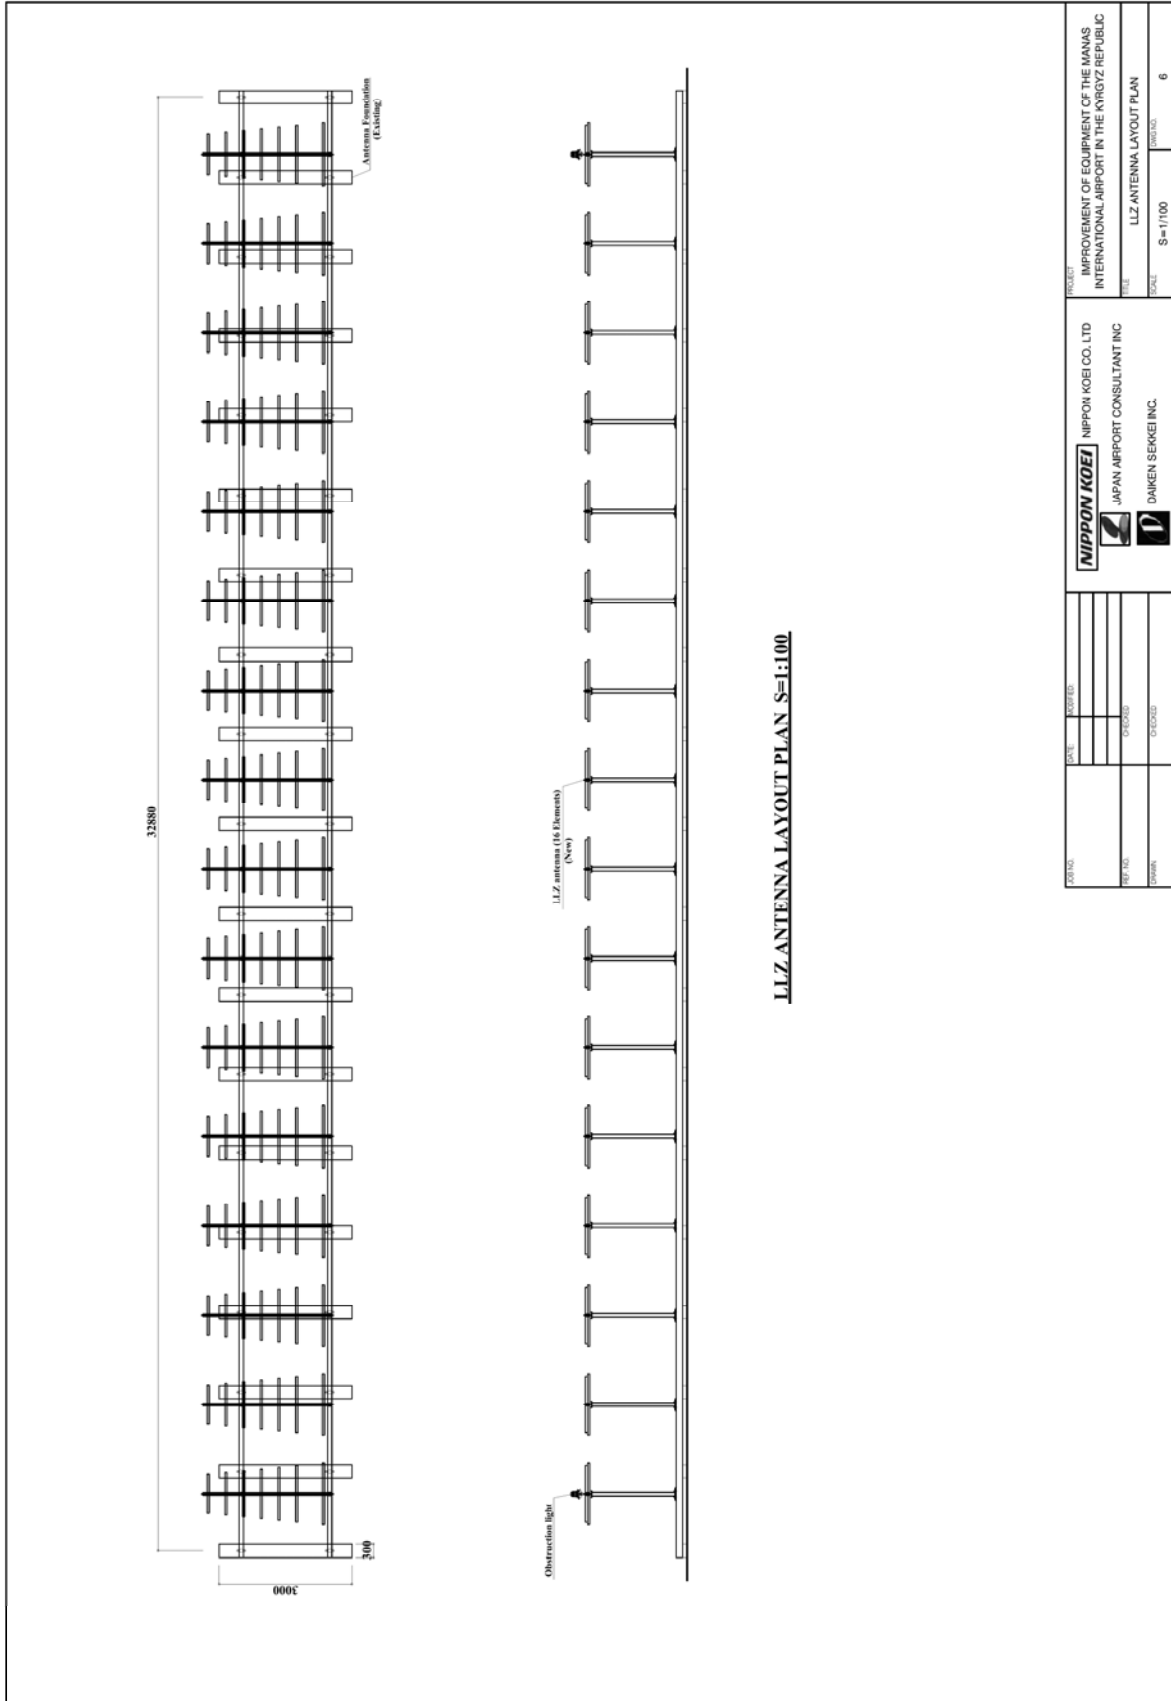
LLZ Facility Layout Plan for Runway 08 Side
